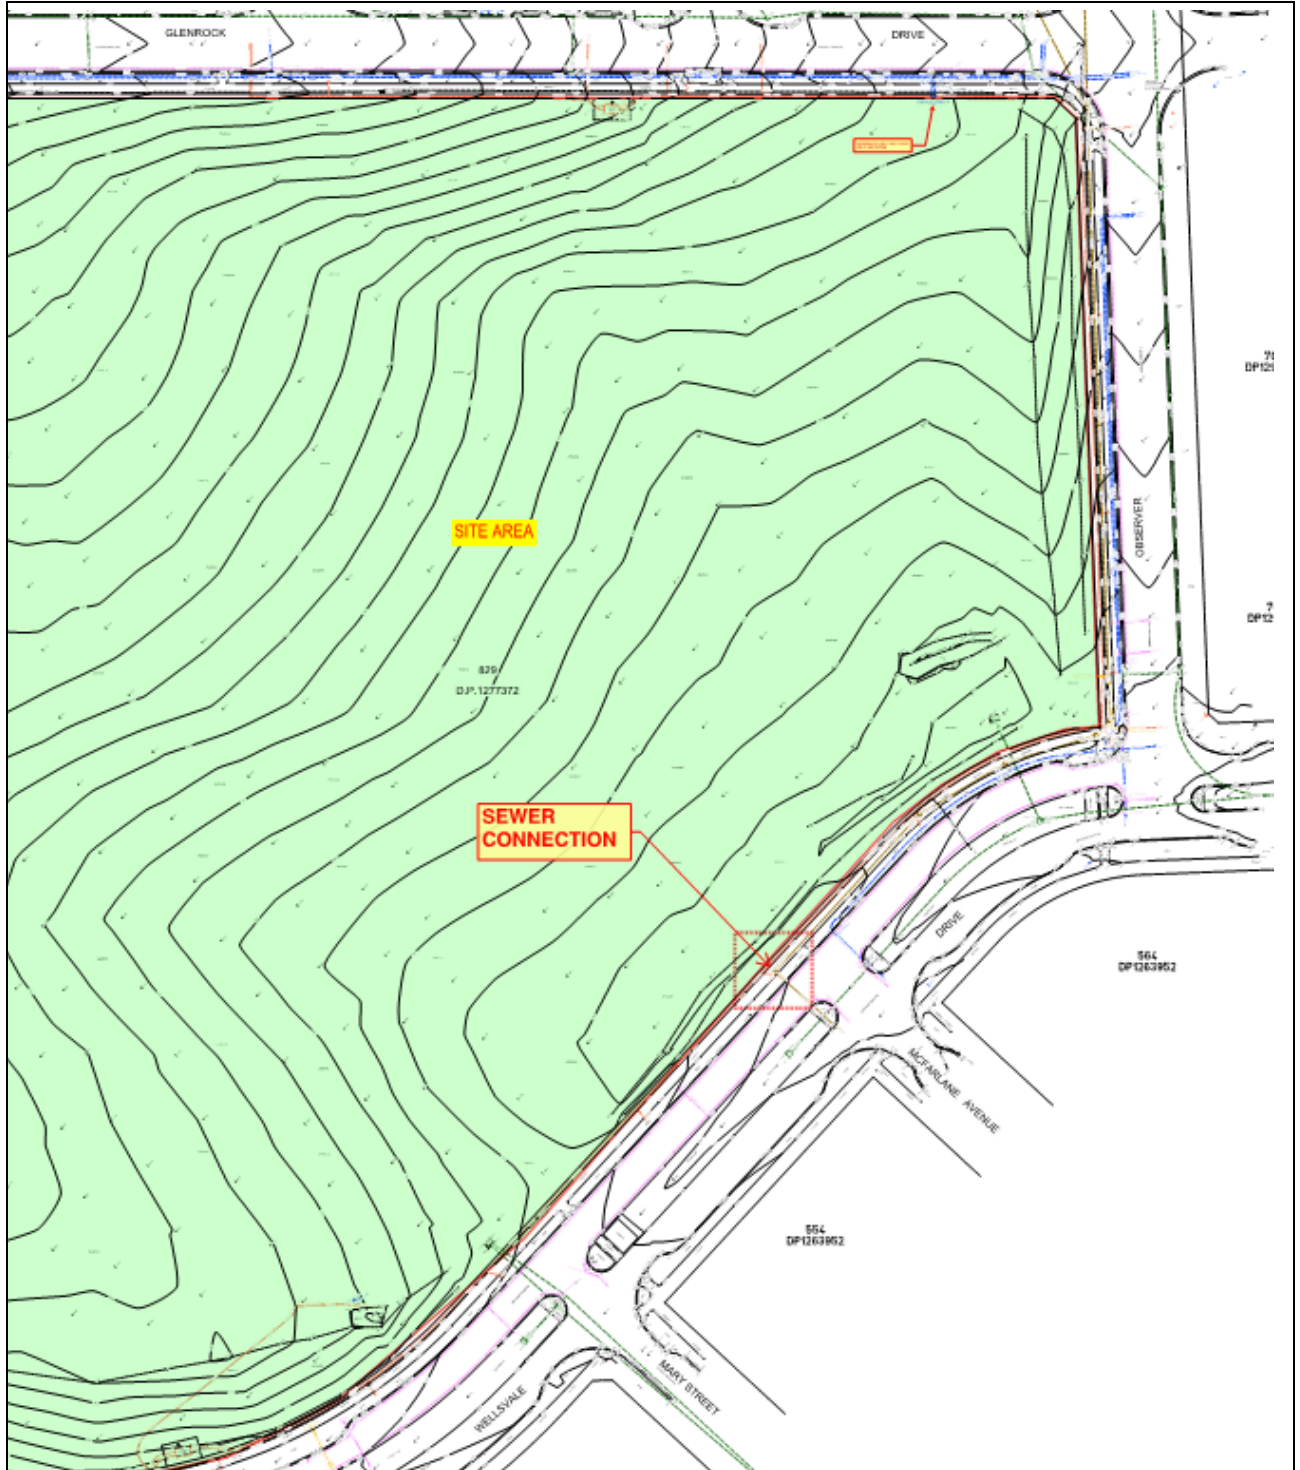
Detailed Survey by CMS Surveyors – Sewer (Part Plan)
